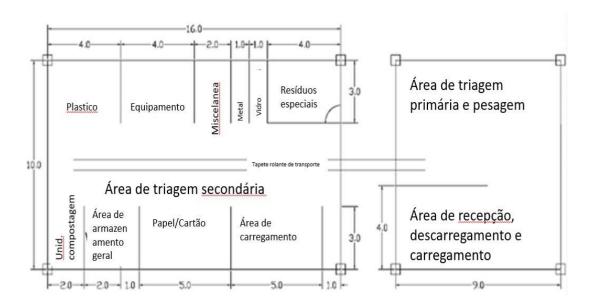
Proposed layout of the main building of the recyclable waste collection and transfer facility
